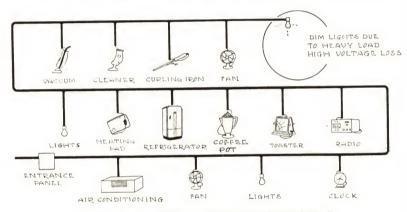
Result of Failing to Plan Lighting Circuits Properly
